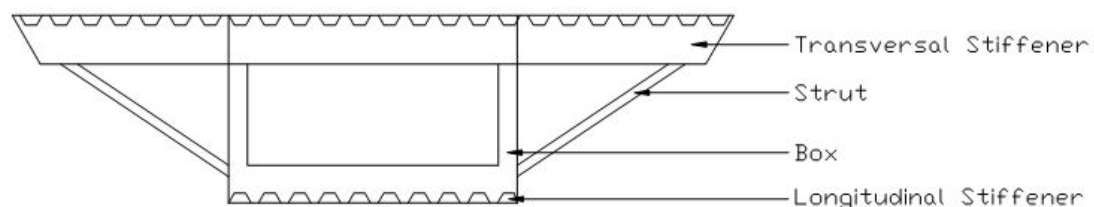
Box girder deck with struts supporting cantilever deck.
